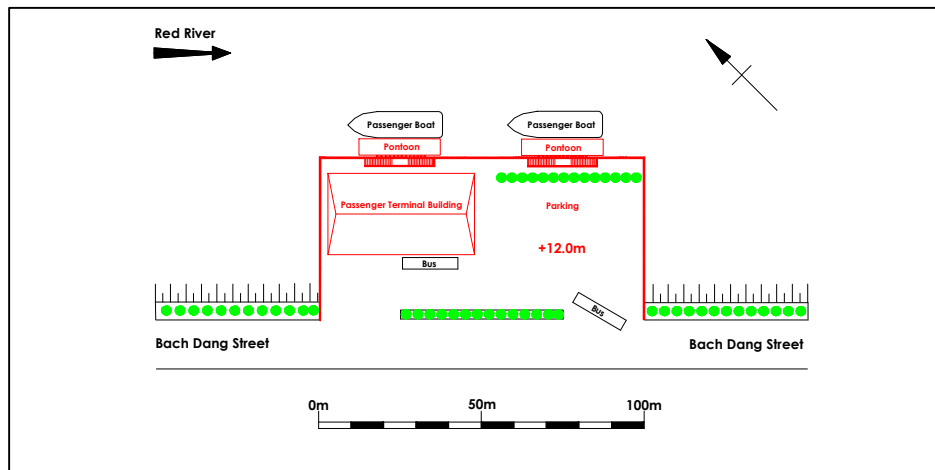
Plan of New Passenger Terminal (2010, 2020)
